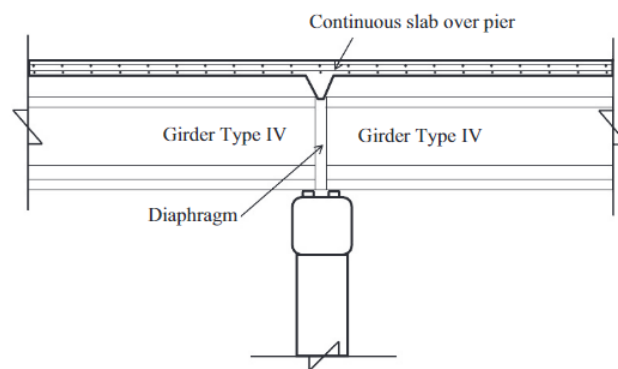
Superstructure of a typical bridge with precast girders made continuous (Eamon, 2016)
